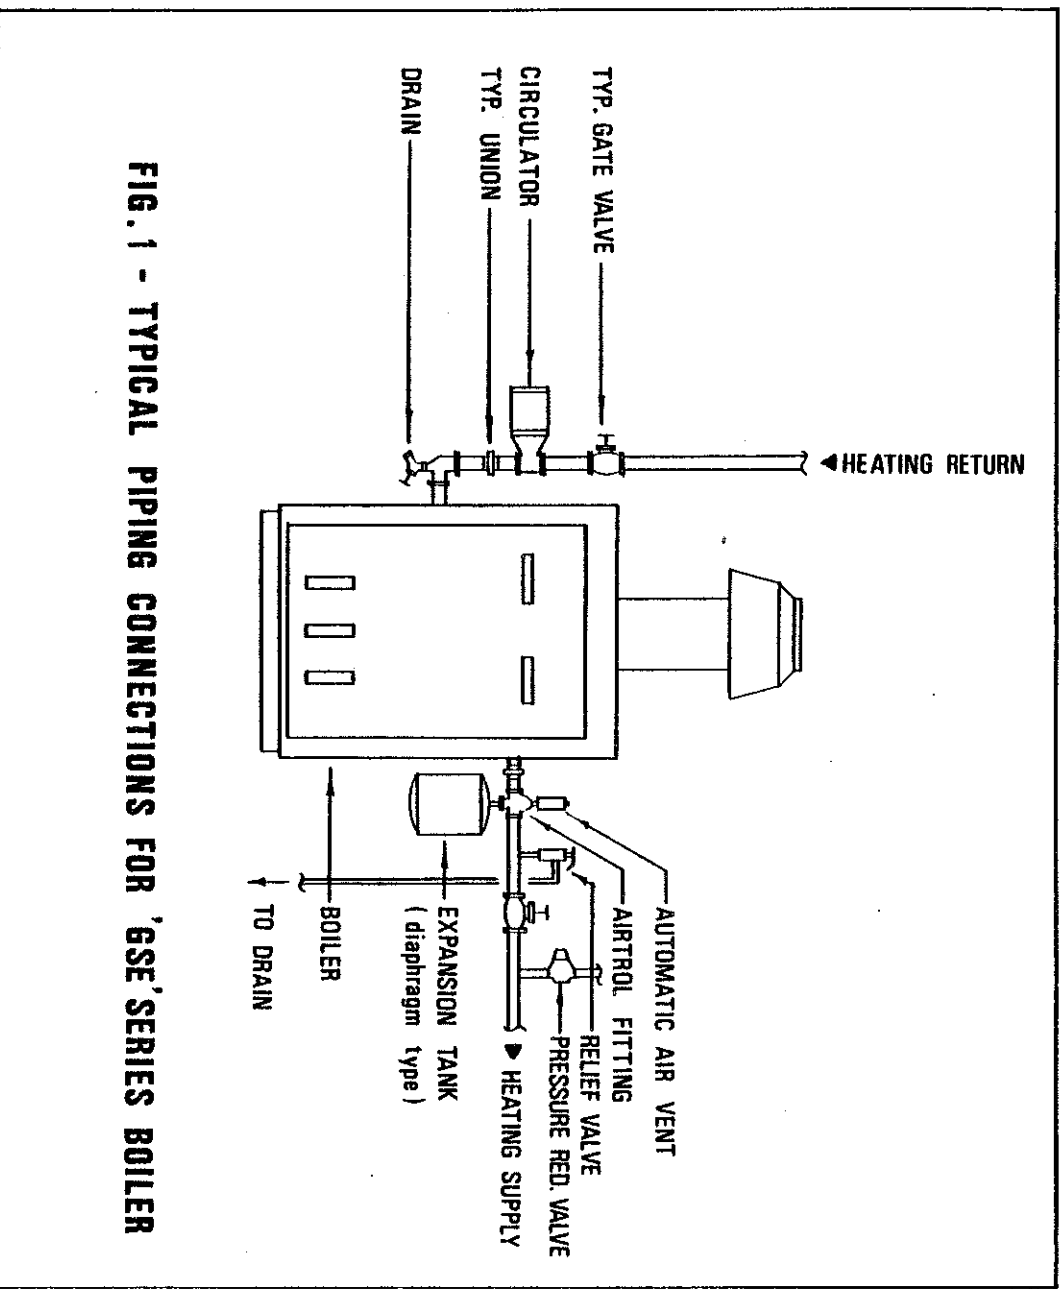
TYPICAL PIPING CONNECTIONS FOR 'GSE' SERIES BOILER
